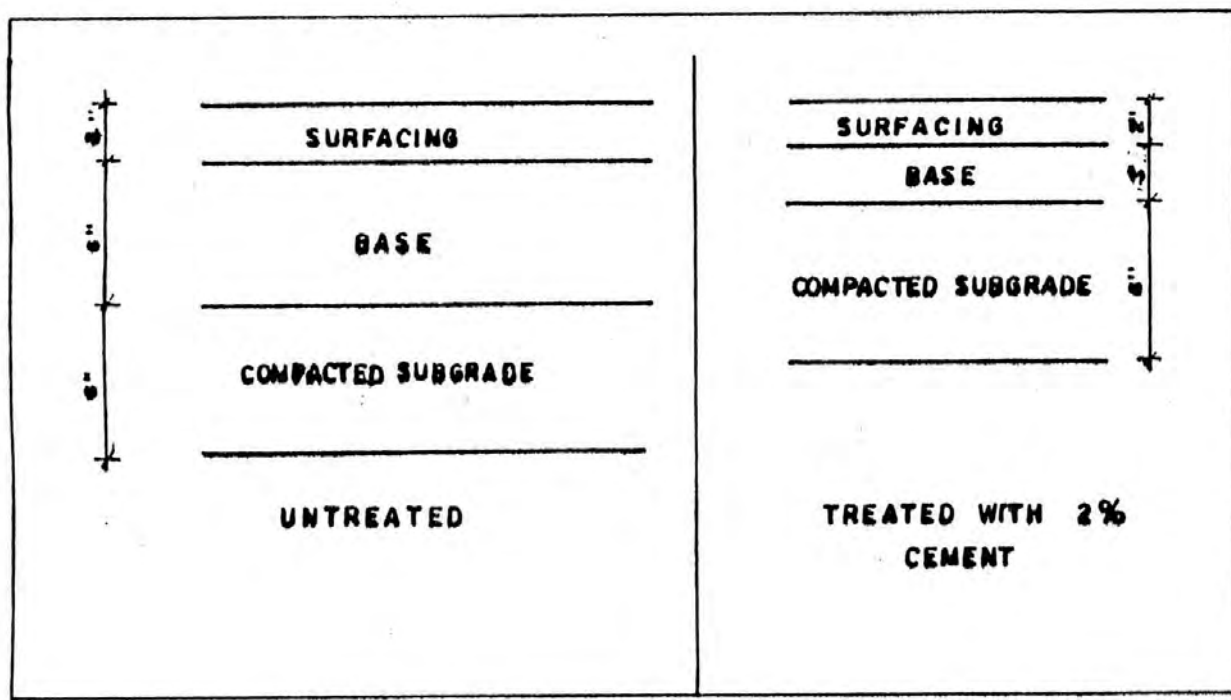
TRIAL SECTION, ASPHALT INSTITUTE METHOD
